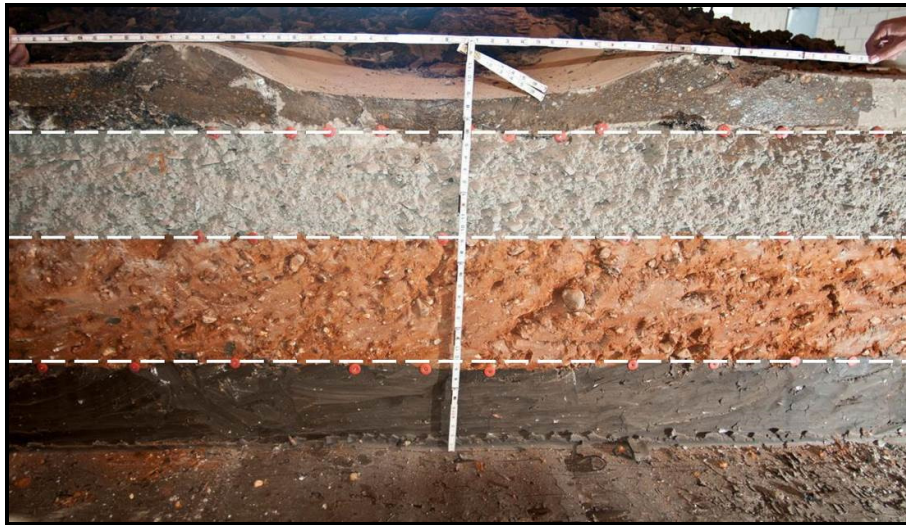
Typical Rutted Asphalt over Intact Pavement Substructure after Traffic.
